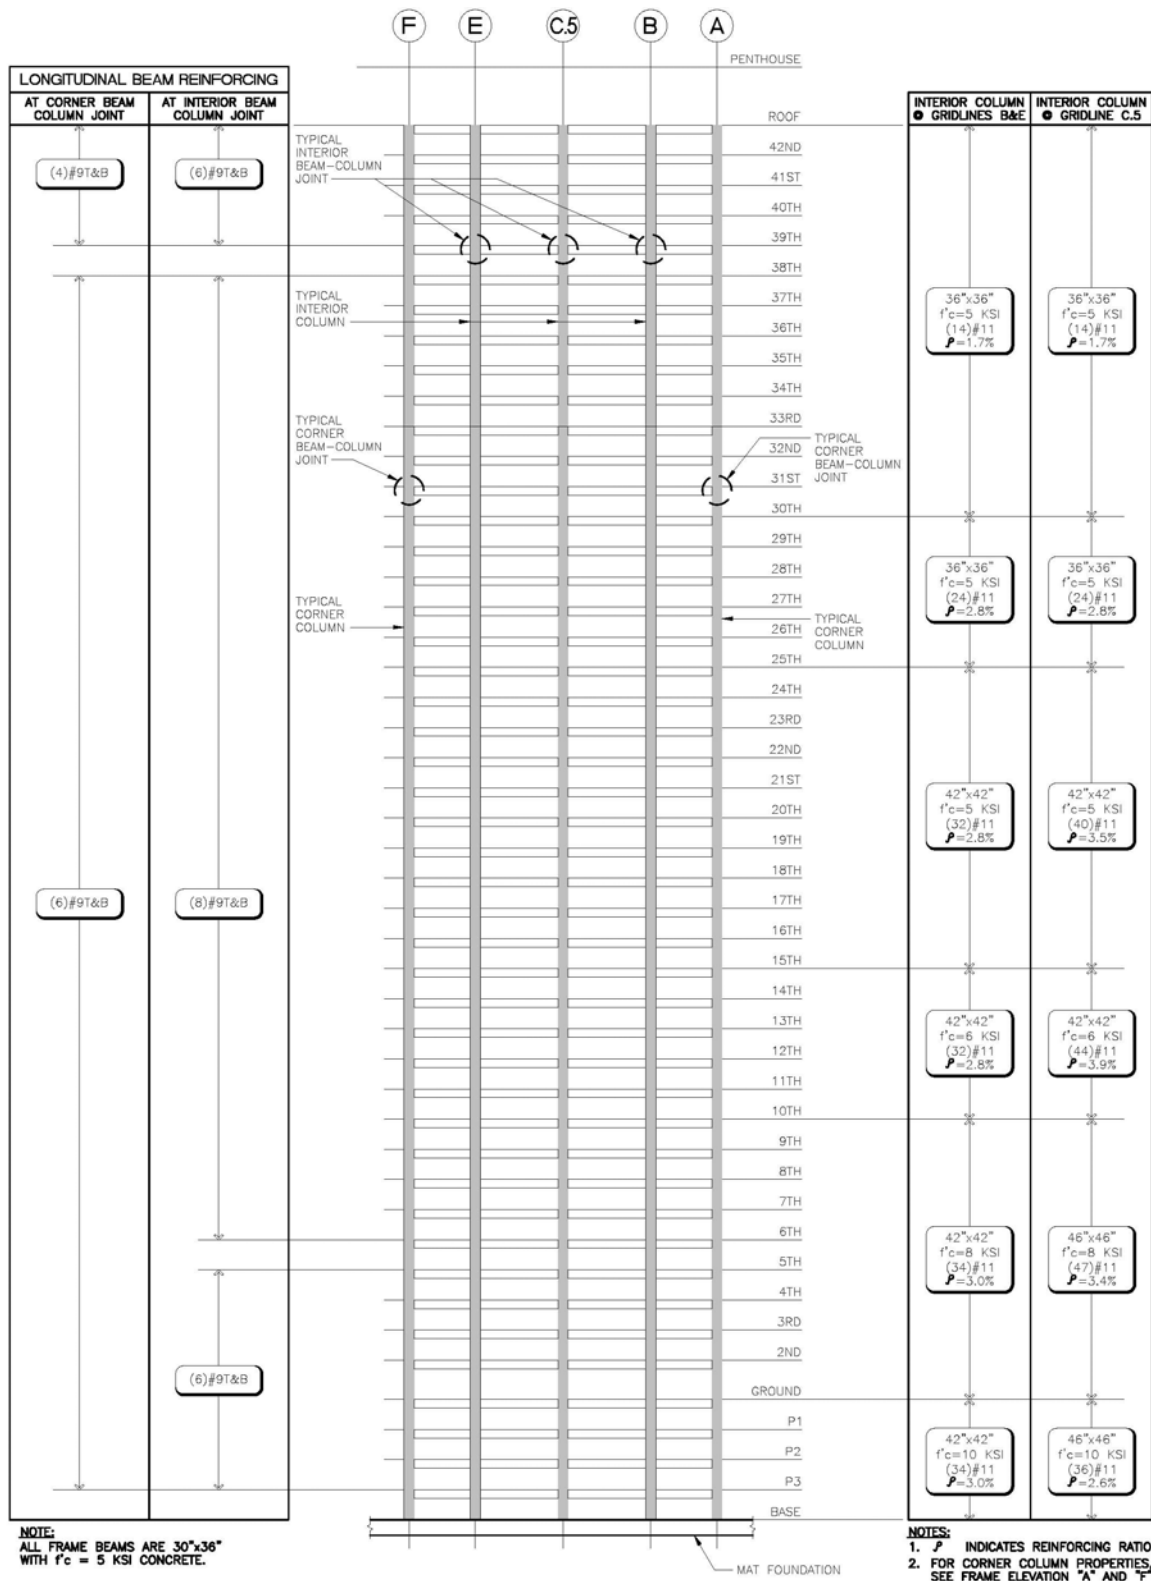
Elevation and properties of frames 2 and 5 for building 2A
